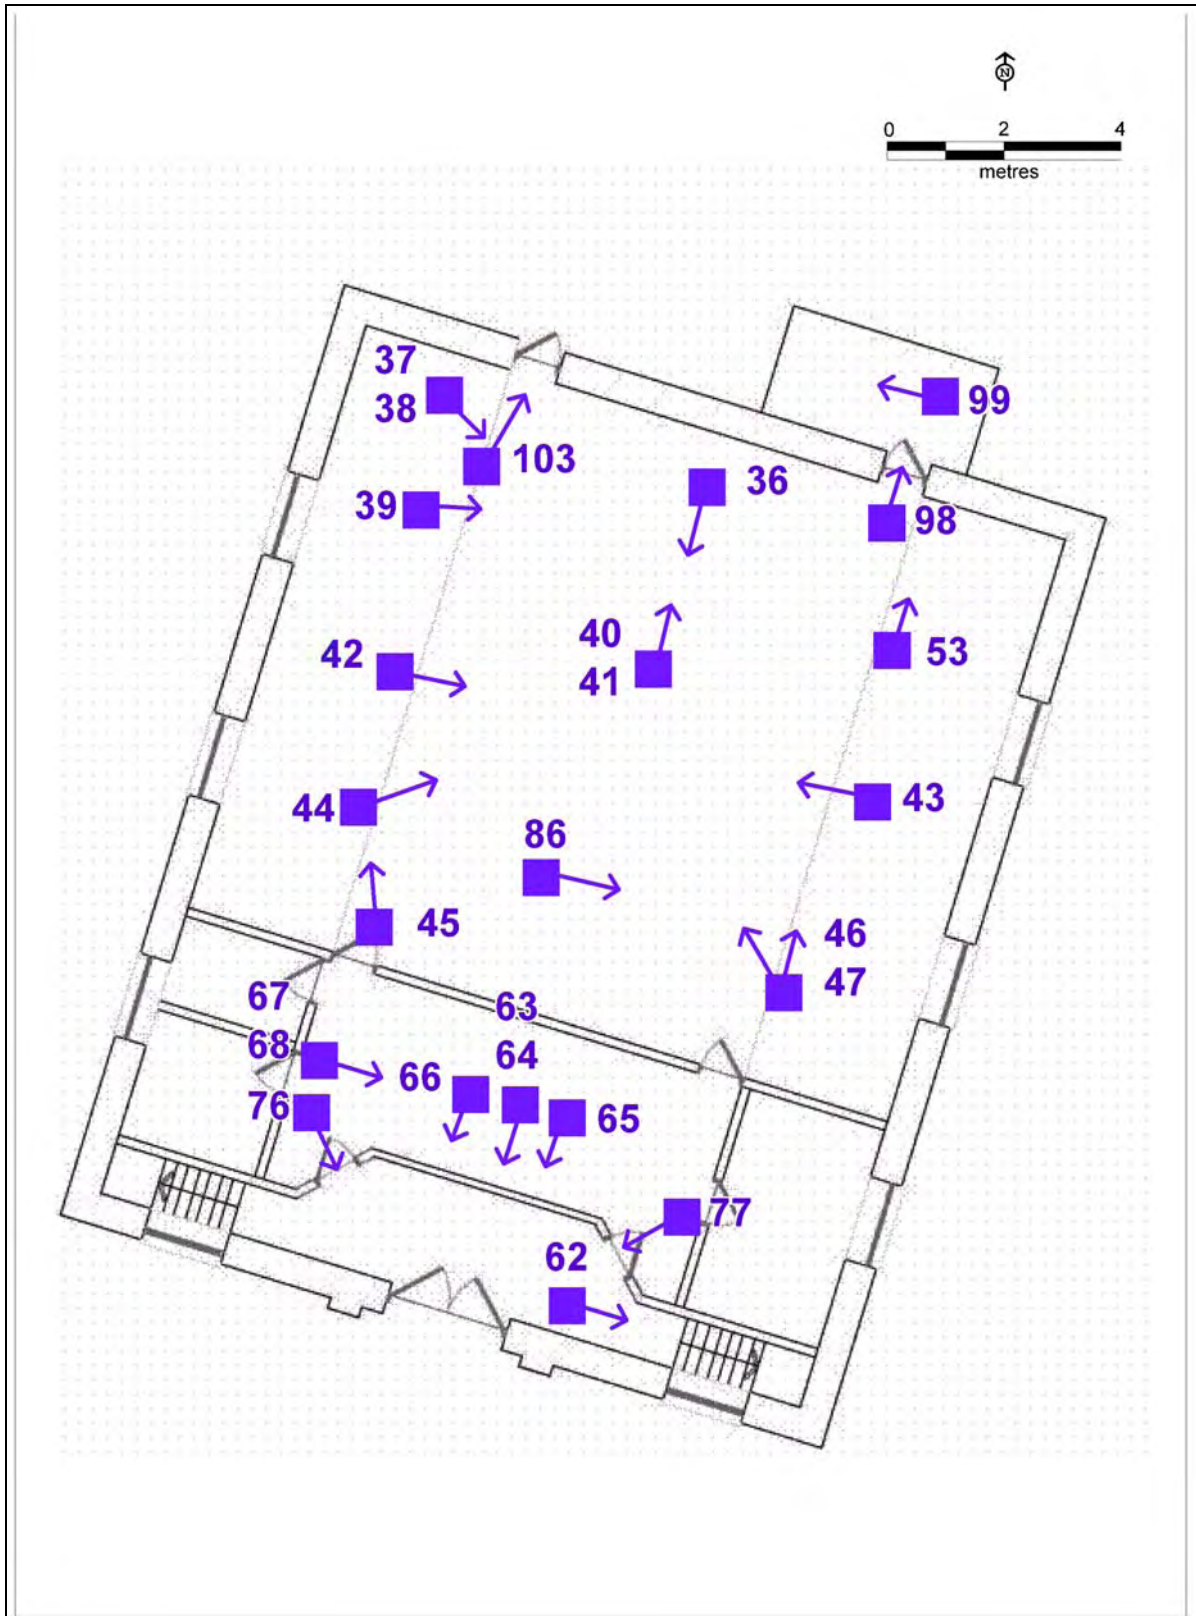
Location of photographs. Internal views of ground floor of chapel, see also Figures 10 and 11.
